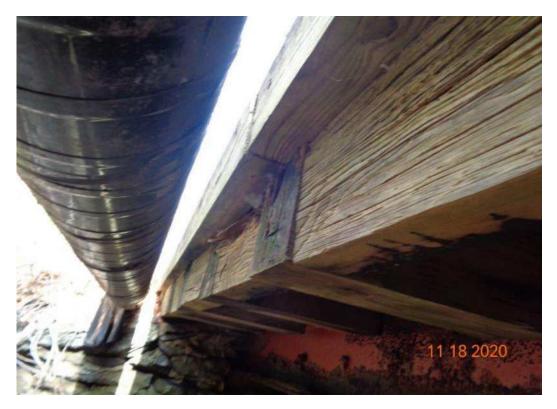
West deck fascia, from Abutment 1 looking to Abutment 2
